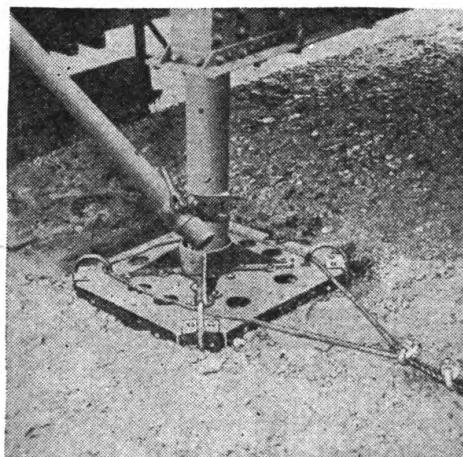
Trestle shoe with bracing strut and anchor cable.
